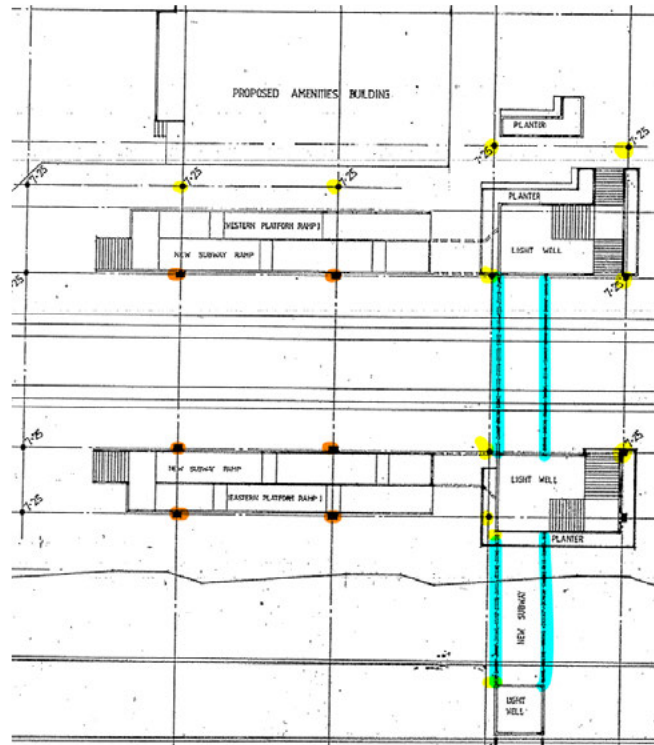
Excerpt Existing Drawing C55 Column Layout Plan with tunnel outline (blue), independent columns (yellow) inbuilt columns (orange)
